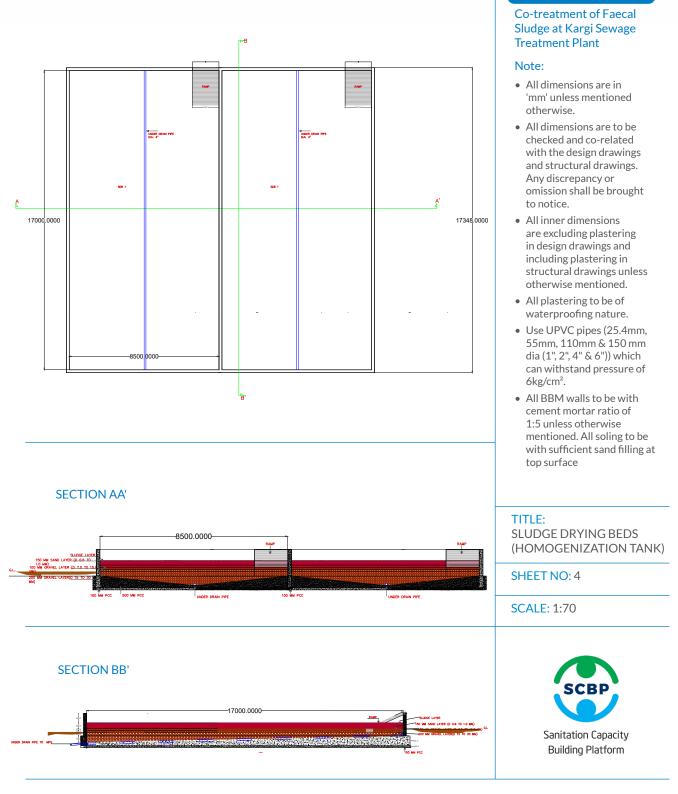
Plan and cross section of sludge drying beds for bottom sludge of homogenisation tank
